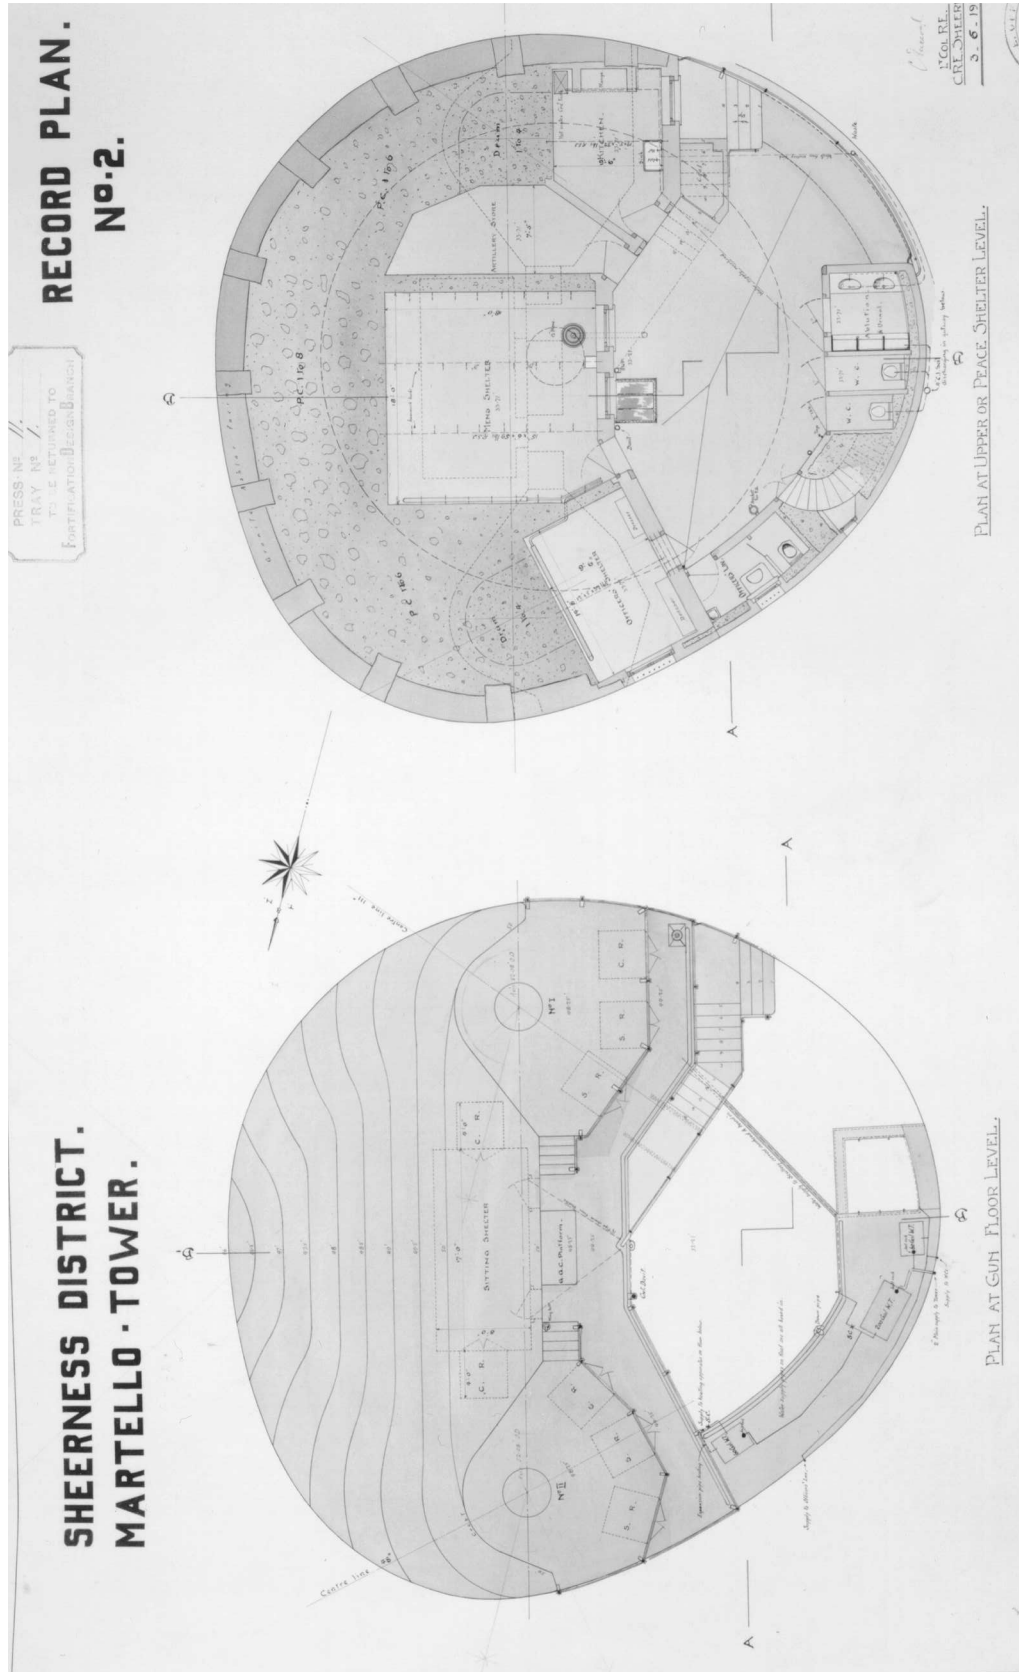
Plans dated 1914 of the gun and upper floors of Grain Tower (PRO: WO/78/5121/2)
